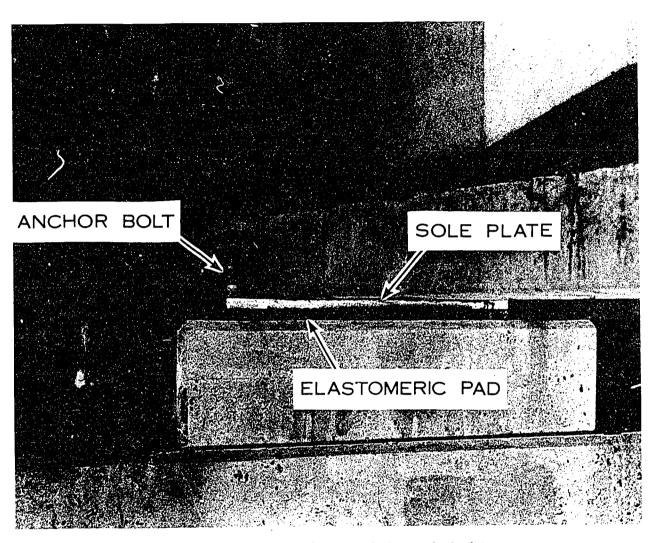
Elastomeric bearing pad. Note steel sole plate.
